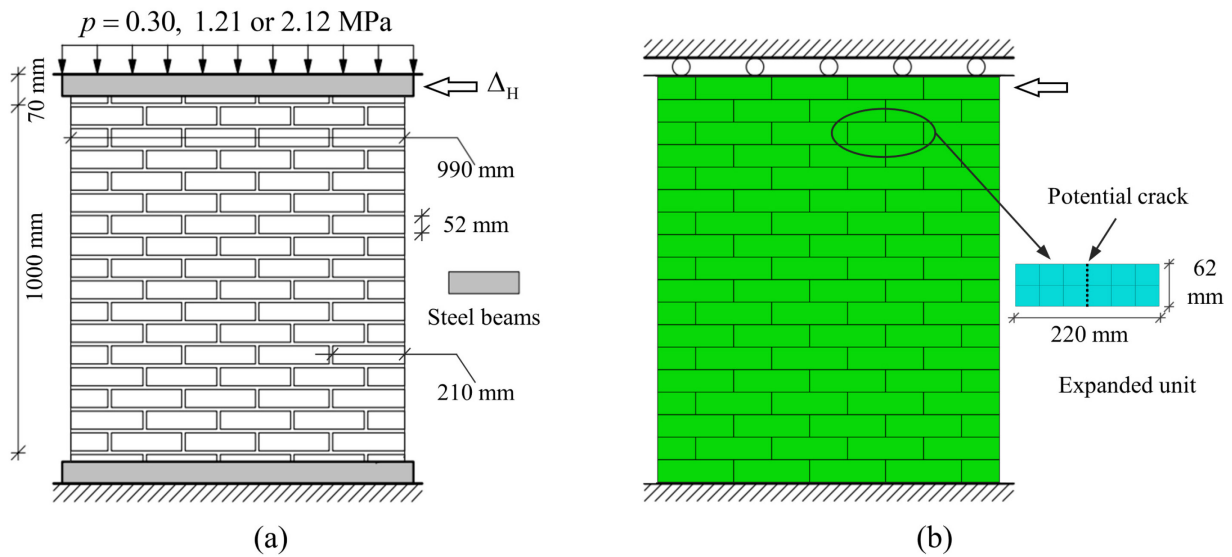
FCB masonry: (a) shear walls and (b) SMM discretization of the shear wall.
